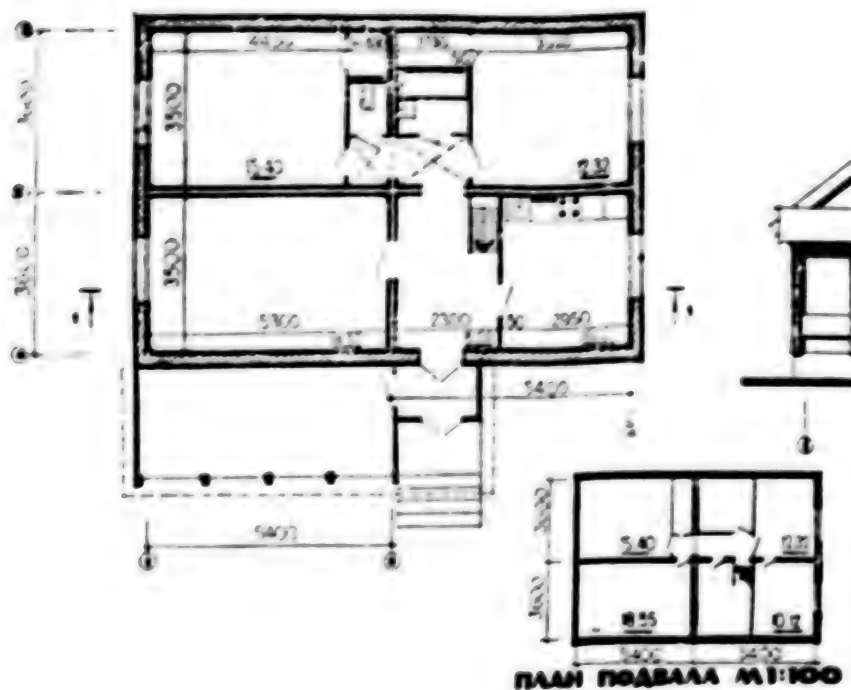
Plan of House Made of Large Blocks (Frontal View)
